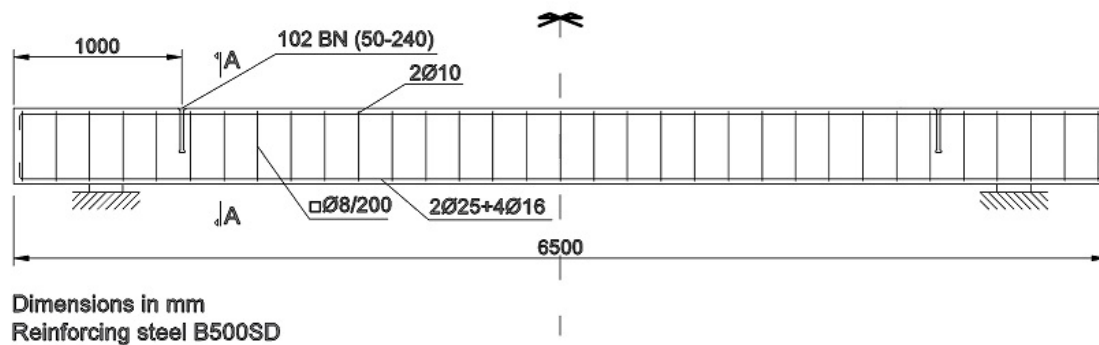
Geometry and reinforcement layout for flexural behaviour test beams
